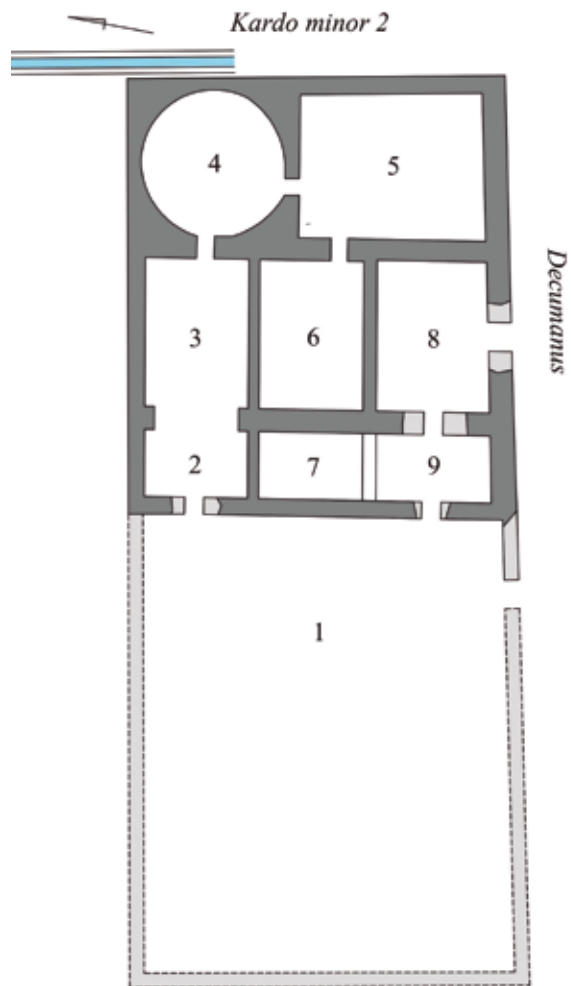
Schematic floor plan of the earliest thermal building (Phase 1).
